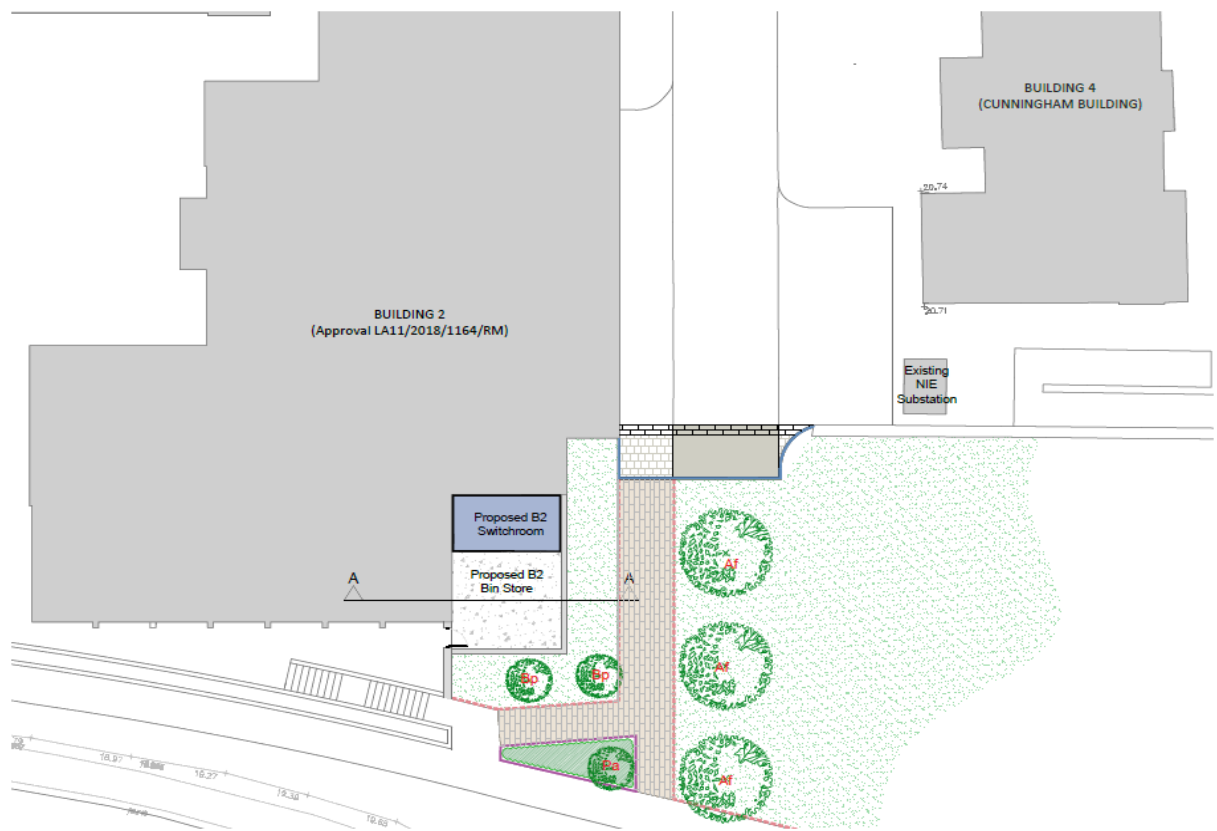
Block plan showing switch room, bin store and addition of hard surfacing and footway link
